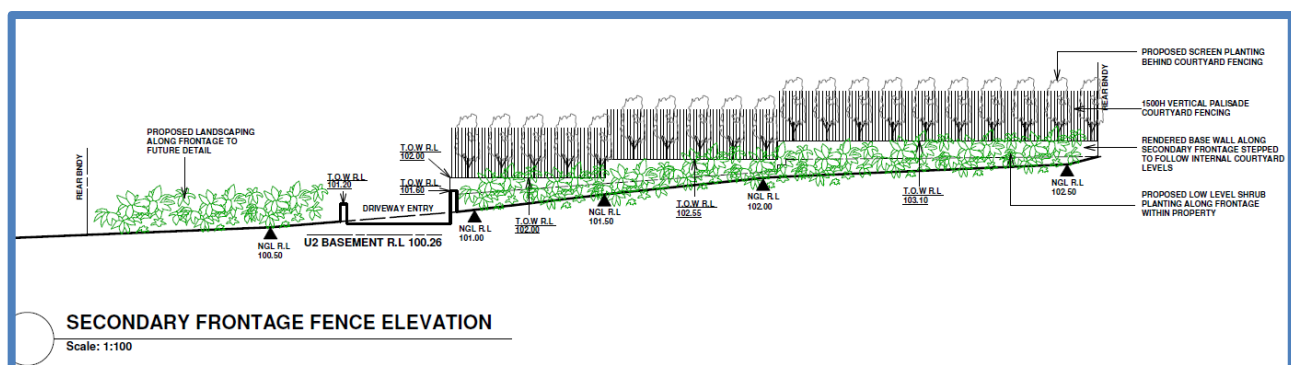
Proposed secondary fence elevational to Ashton Avenue (BDT Design).
